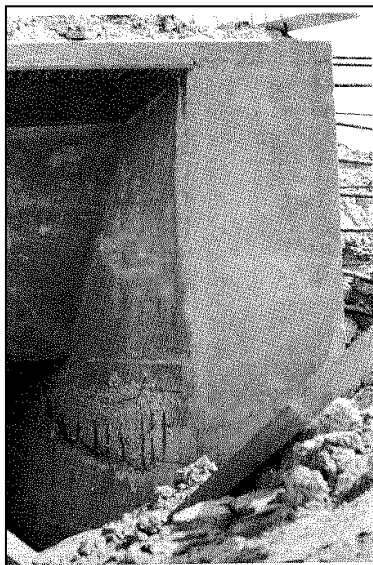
Balboa Street Overcrossing – damage to western abutment
